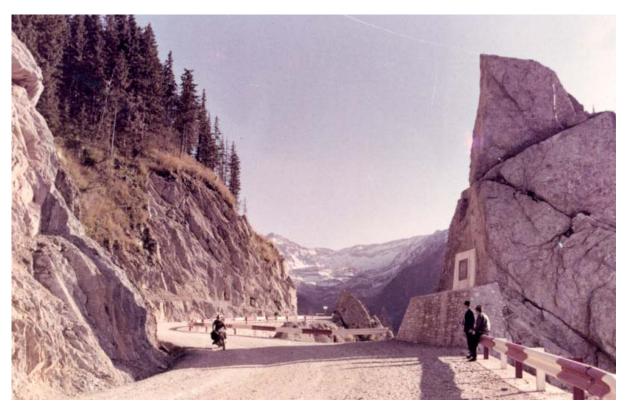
Military Engineering Gate, km 25+320, Bâlea Cascadă – Cascada Bâlea road sector
